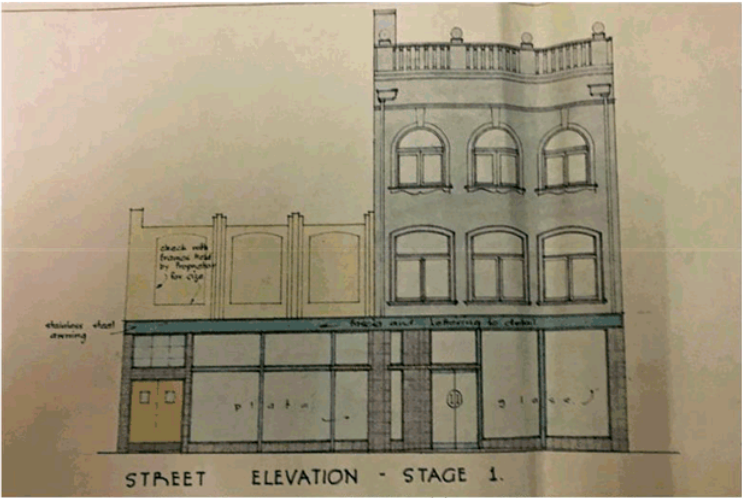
Street elevations, stage 1 (TAHO, AE417/2/2054, 79 Collins Street, (13286))
